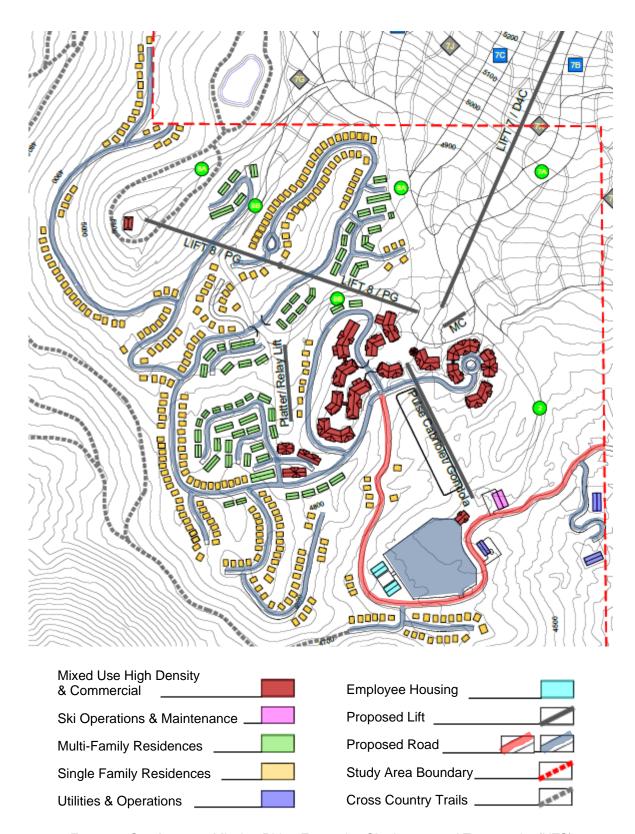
SITE LAYOUT. Mission Ridge Expansion Site Layout and Topography (NTS)
